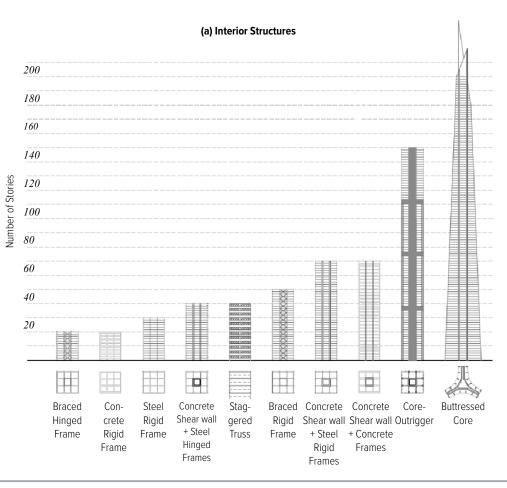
CLASSIFICATION OF TALL BUILDING STRUCTURAL SYSTEMS BY MIR M. ALI AND KYOUNG SUN MOON [3]
